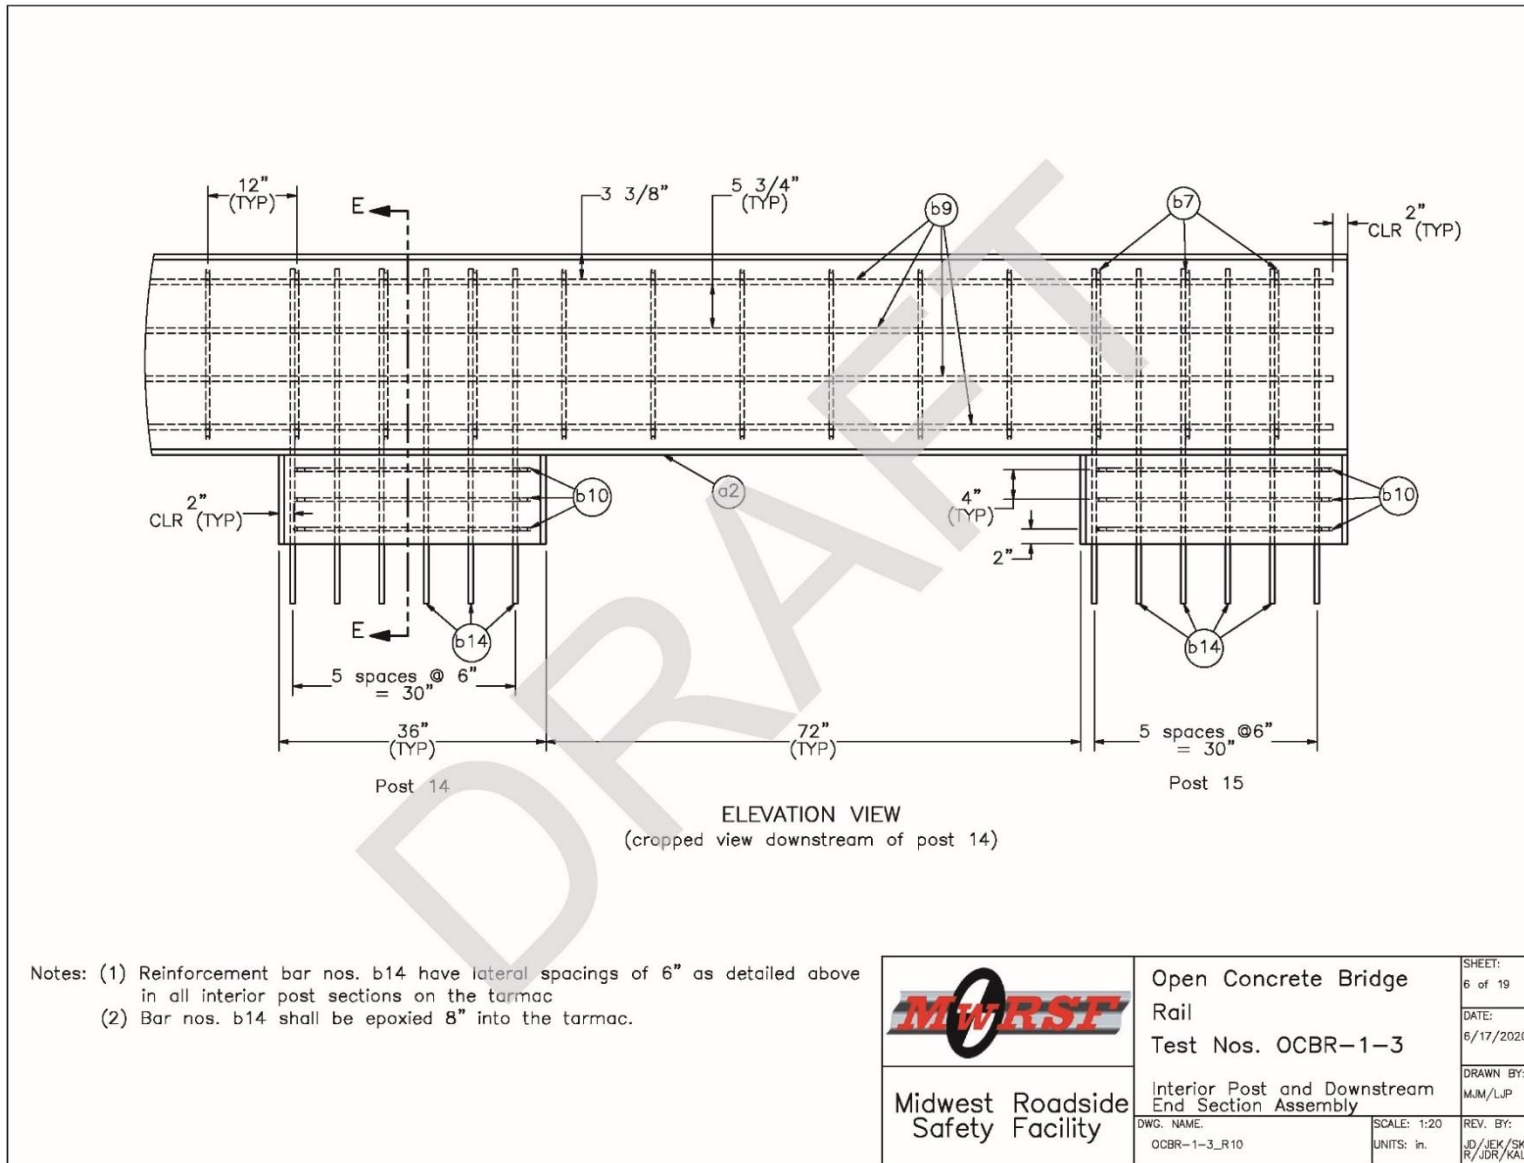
Open Concrete Bridge Rail Interior Post and Downstream End Section Assembly
